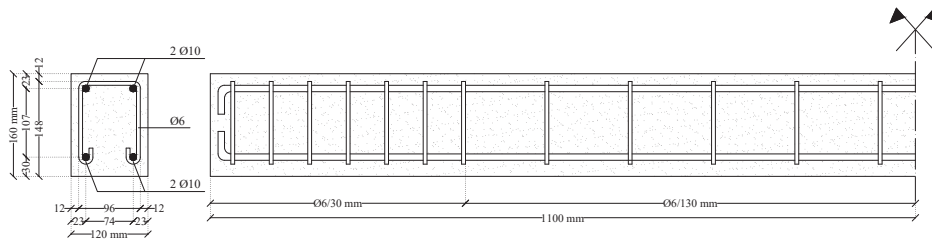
Longitudinal and transverse section of RC beam specimens in the un-strengthened condition
